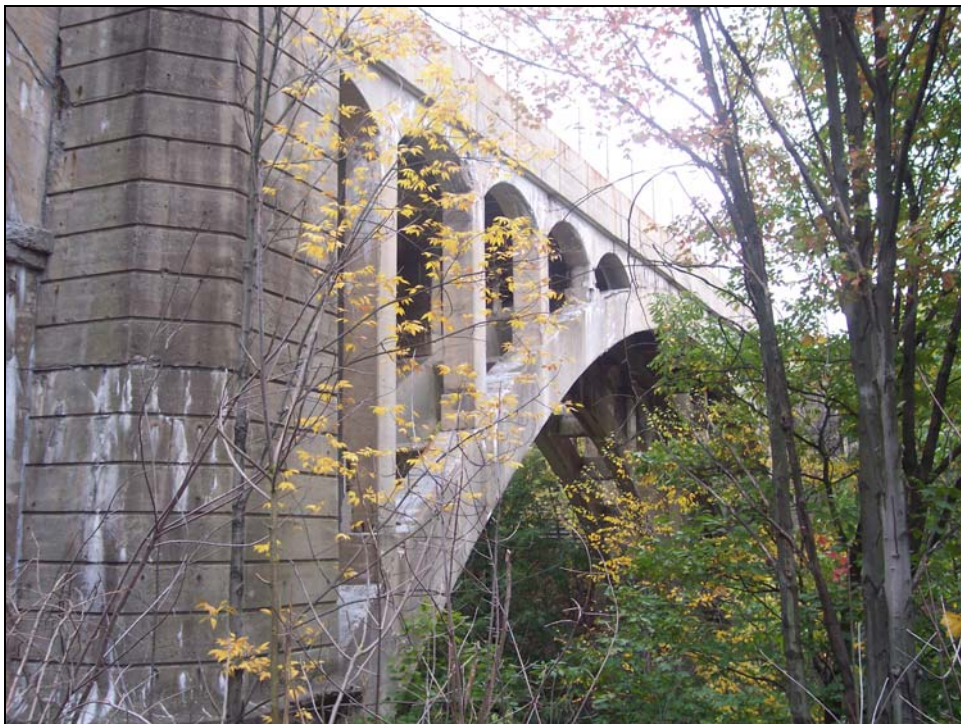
East elevation of Harrison Avenue Bridge showing Span 1 (barrel arch) and Span 2 (spandrel arch) over Central Scranton Expressway and Roaring Brook Gorge, respectively. Note replacement railing.
